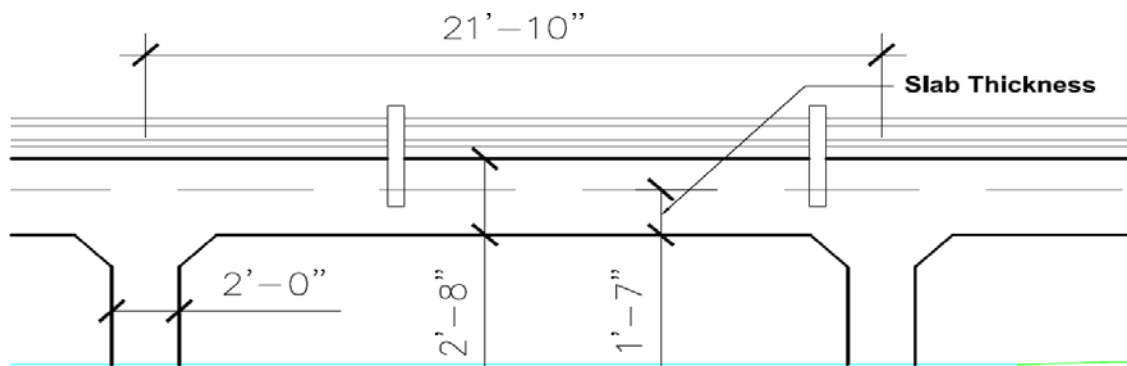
Elevation of Typical Span of Barnes Slough Bridge
